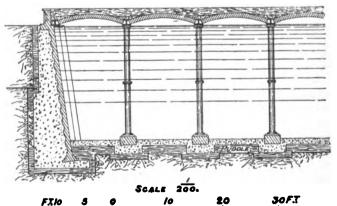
Brick Arches on Cast-iron Girders and Columns.
